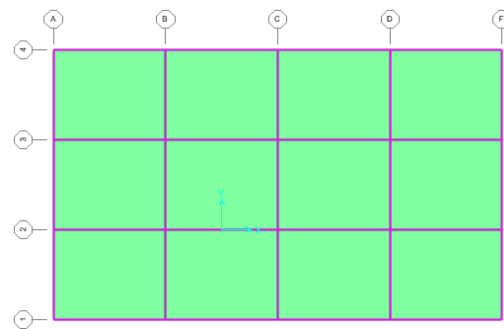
Plan of RC Building (G+5) in SAP2000 v.18
